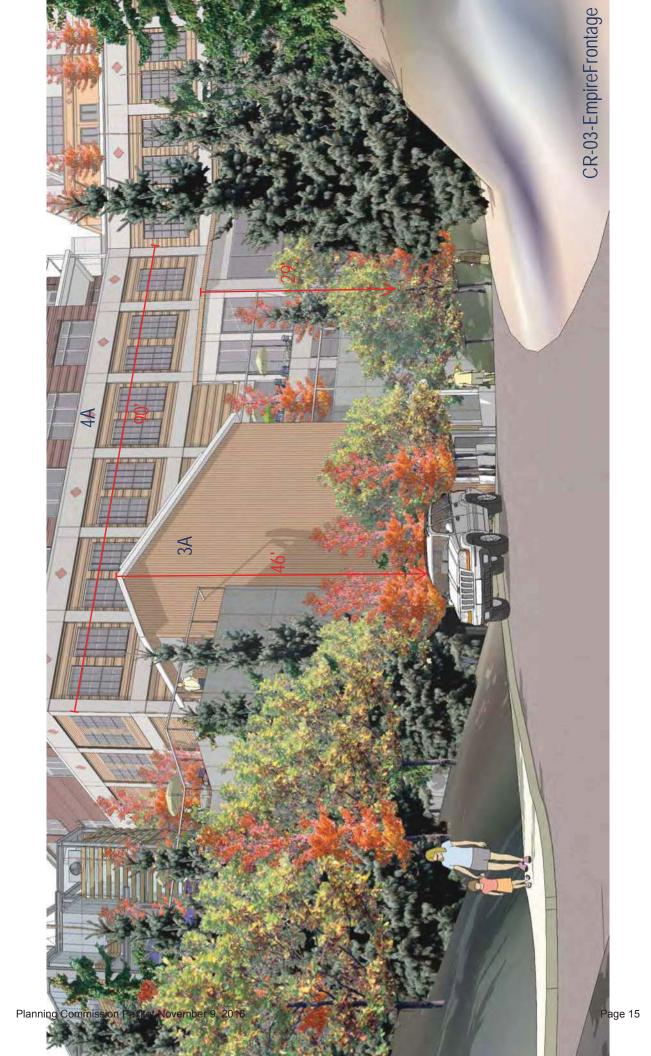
Exhibit HH – SPMP Development Requirements & Restrictions (Sheet 22) - Height
